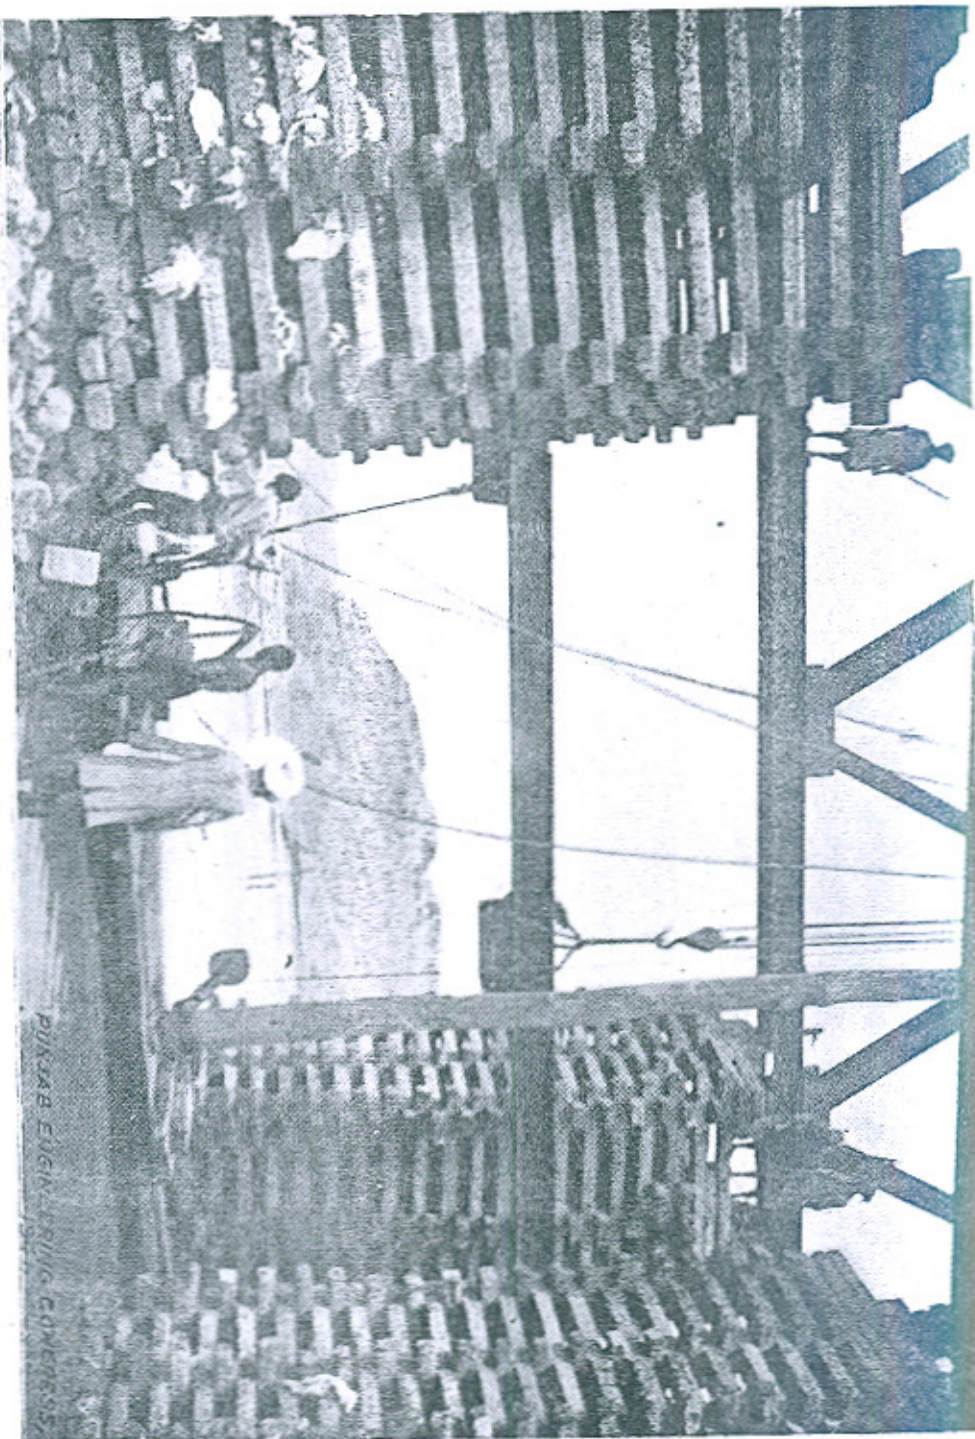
DHOKPATHAN BRIDGE.
